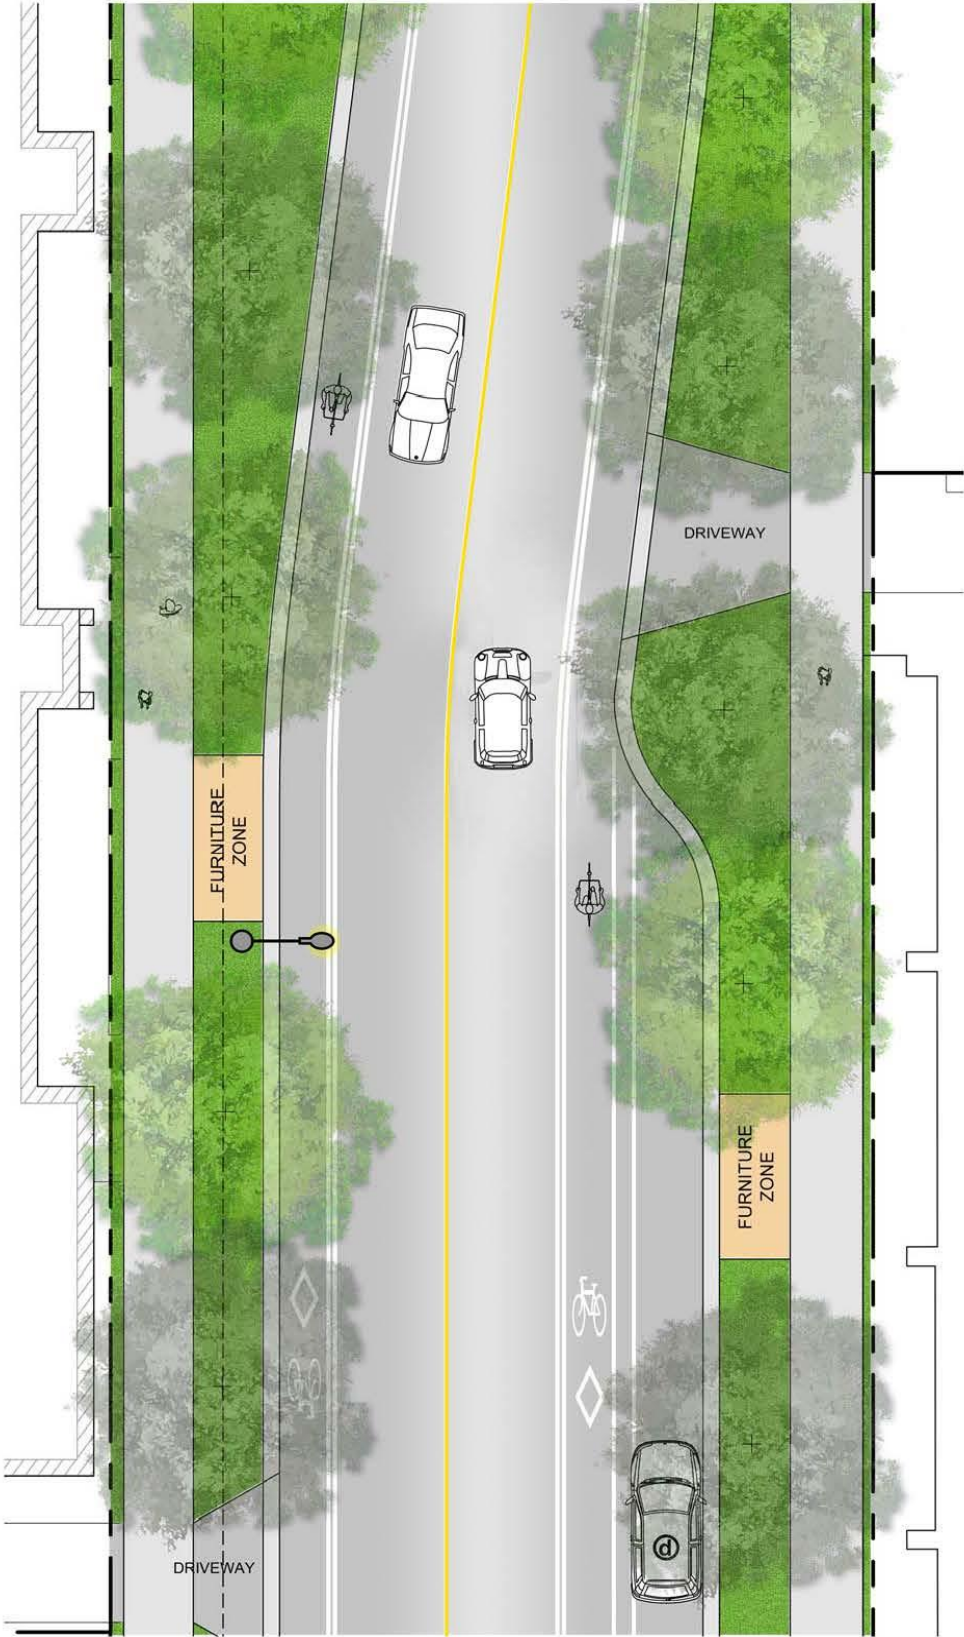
Mixed Use (Albert) Street Option 1b: 2-Way with Segregated Bike Lanes and Pocket Parking on Alternating Sides
